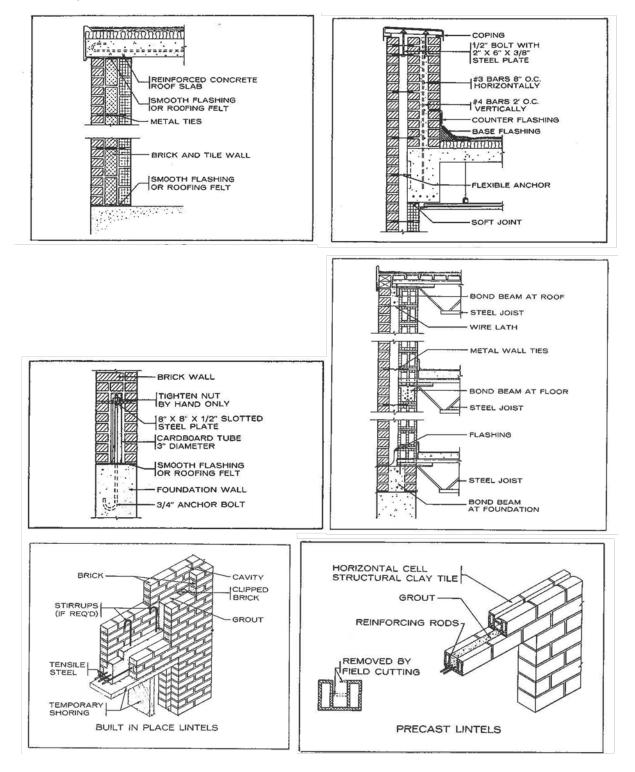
Masonry Details, 1964: Technical Notes on Brick Construction
